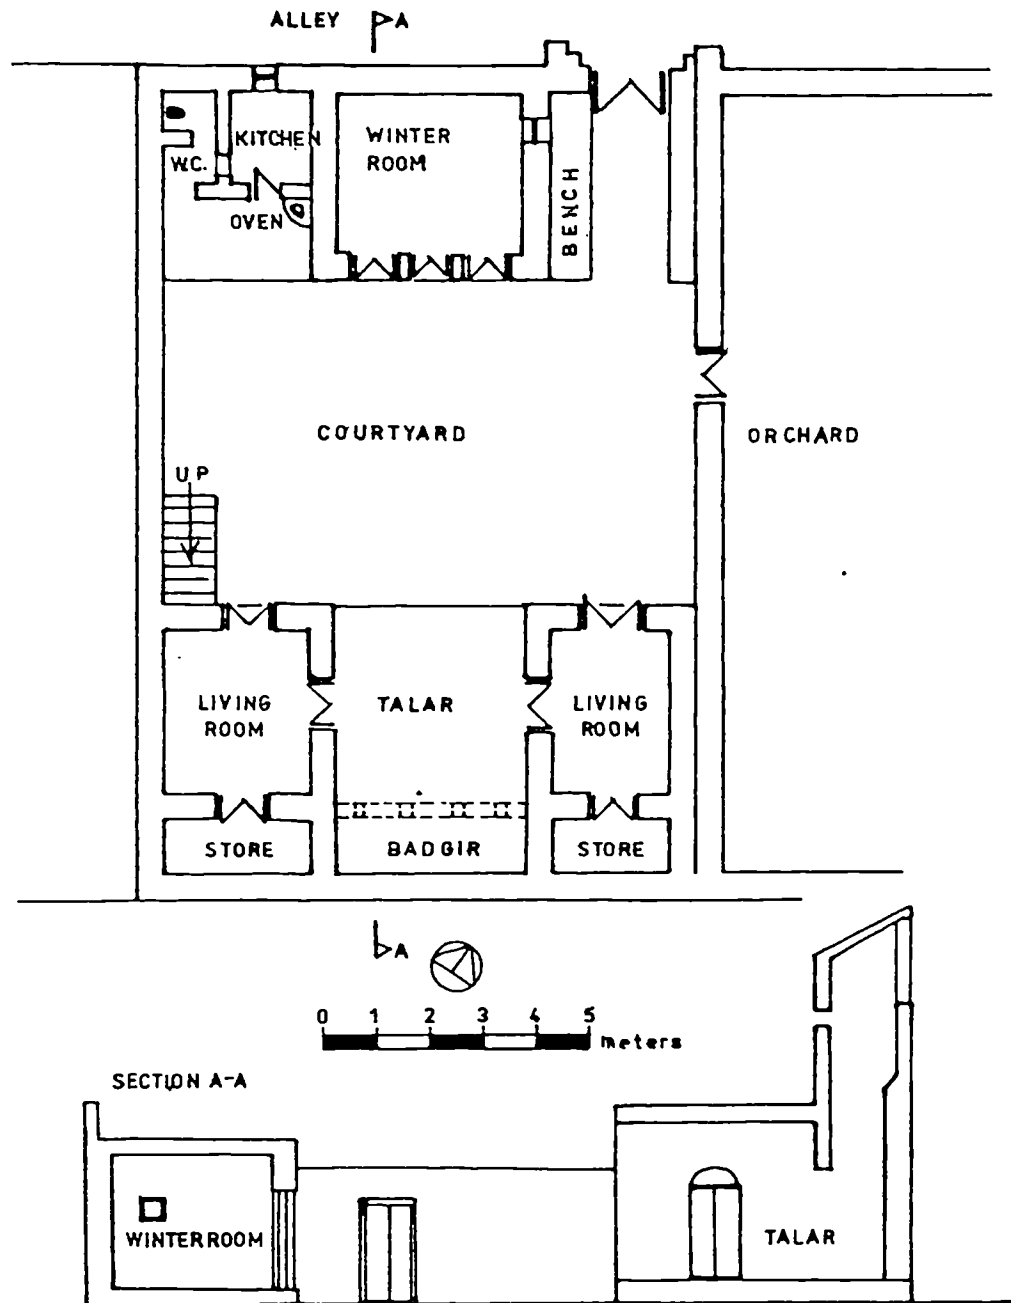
Plan of a courtyard house at Maibud with section through badgir and summer talar.
